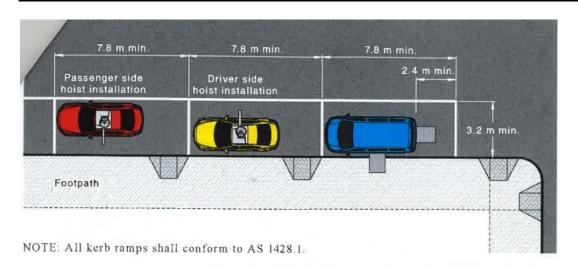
Examples of accessible parallel parking without kerb extensions
